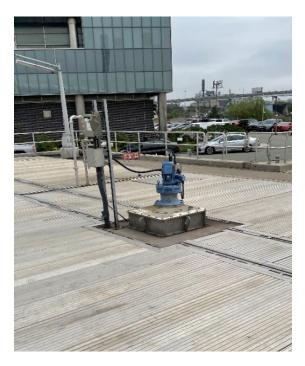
Grit collector mechanisms is largely inaccessible due to aluminium cladding; the drive was visible. The drives are all in good condition.
